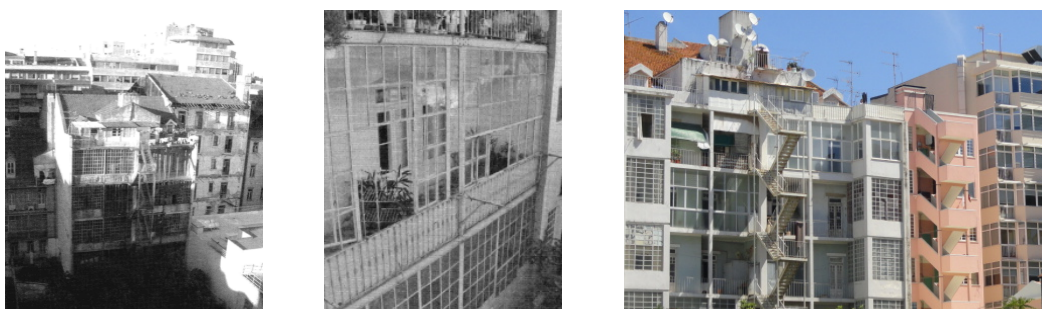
Transformation of the back balconies into galleries (Appleton, 2005) and service staircase in reinforced concrete.
